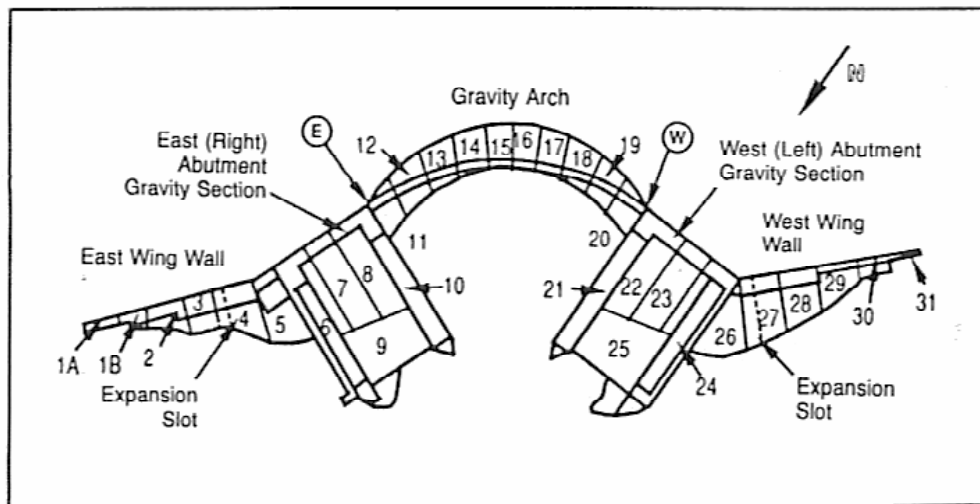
Modifications to the Santeetlah Dam after initial construction involved the placement of massive amounts of concrete on the gravity abutment blocks (blocks 6 and 10 on the east abutment and blocks 21 and 24 on the west abutment). Later modifications added concrete to blocks 7, 8, 9, 22, 23, and 25, and prestressed rock anchors in the wing walls.
